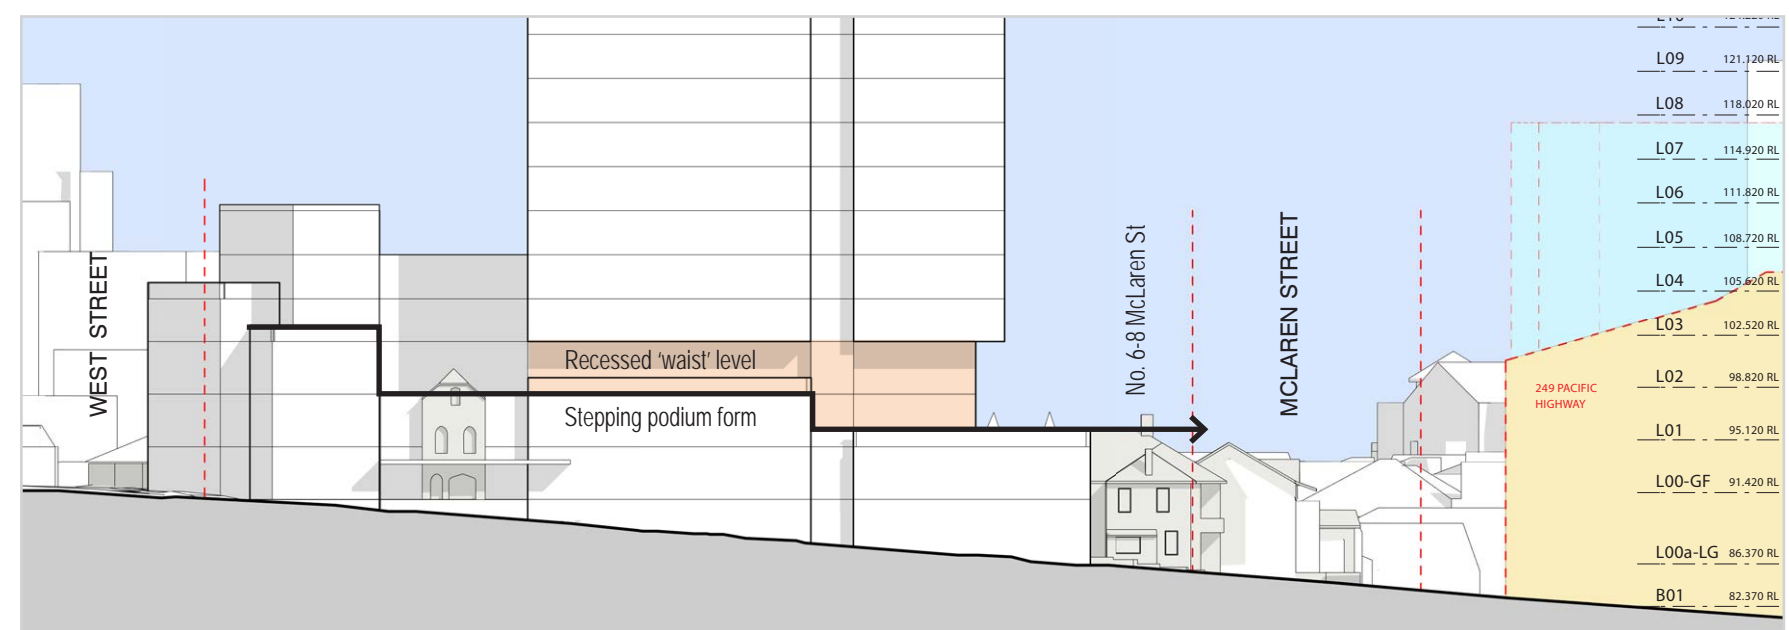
Elevation along Pacific Highway (adapted from Building Envelope Study and Reference Design - Elevation - West - Pacific Highway).
